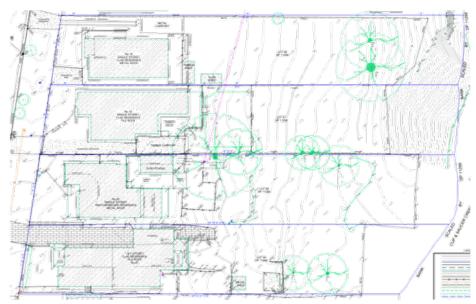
Existing site form Source: Detailed Survey – Axiom Spatial Surveyors Pty Ltd
